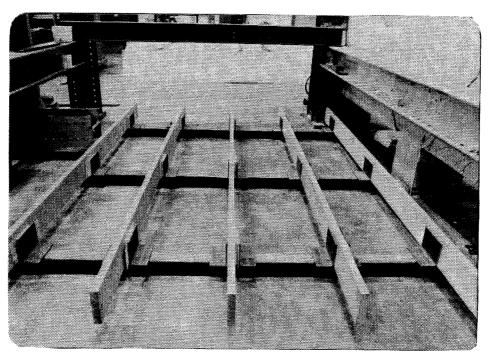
Steel Frame and Wood Joists used for the Concentrated Load Tests
